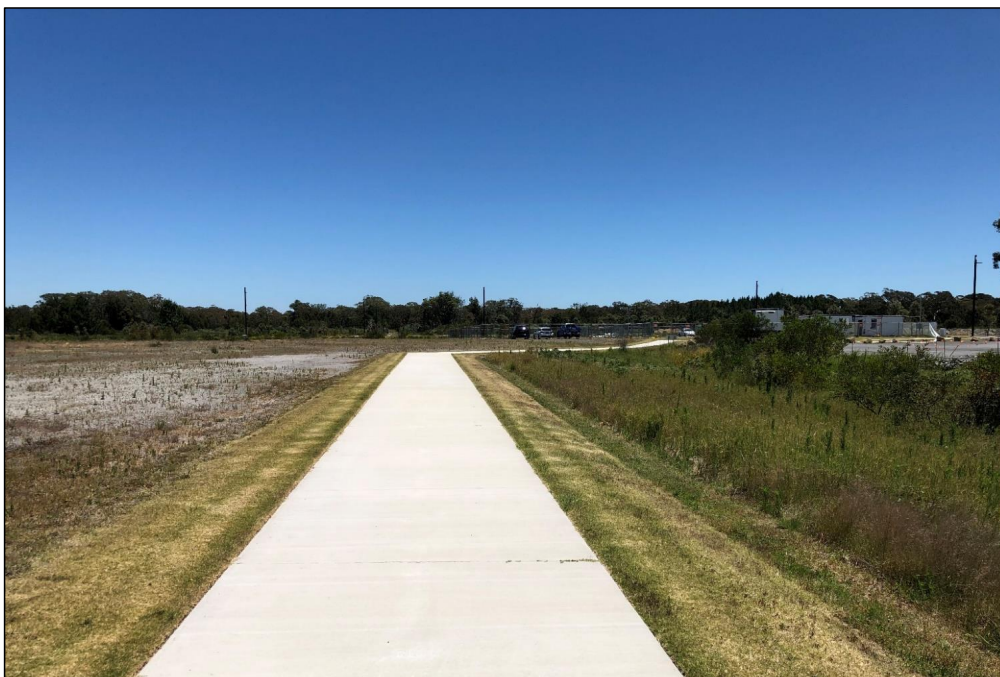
Existing footpath connecting proposed car park and Stage 1 Astra Aerolab development lots
